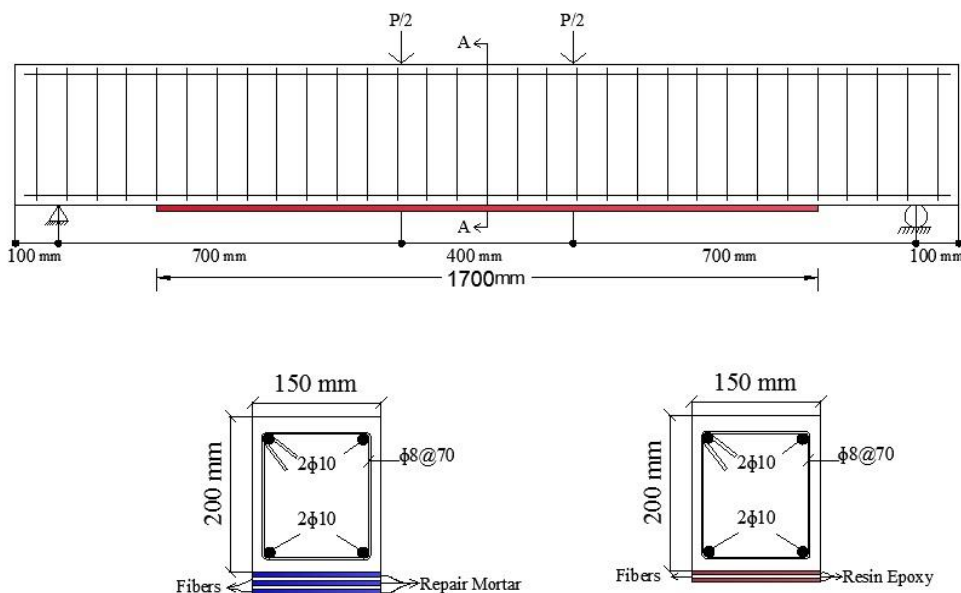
The dimension, longitudinal and transverse reinforcement arrangement and the location of the applied loads (the dimensions are based on mm) of (a) the specimen strengthened with CFRP and epoxy resin and (b) the specimen strengthened with CFRP and cement-based mortar
